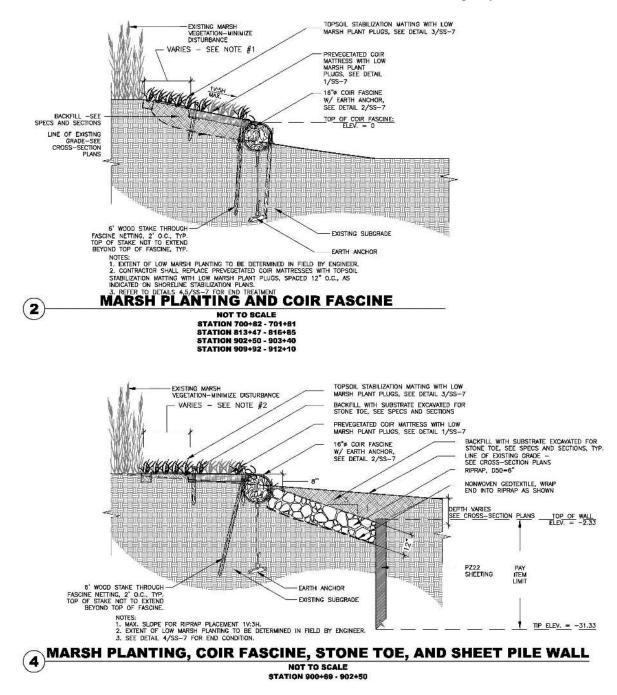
Cross-section design details for marsh shoreline stabilization in Great Egg Harbor Bay, NJ (Traylor 2017; NJDOT 2009). Detail 2 was used along shorelines with the lowest wave energy exposure. The project engineers specifically designed Detail 4 to address increased exposure to boat wake energy as a result of navigation channel realignment.
